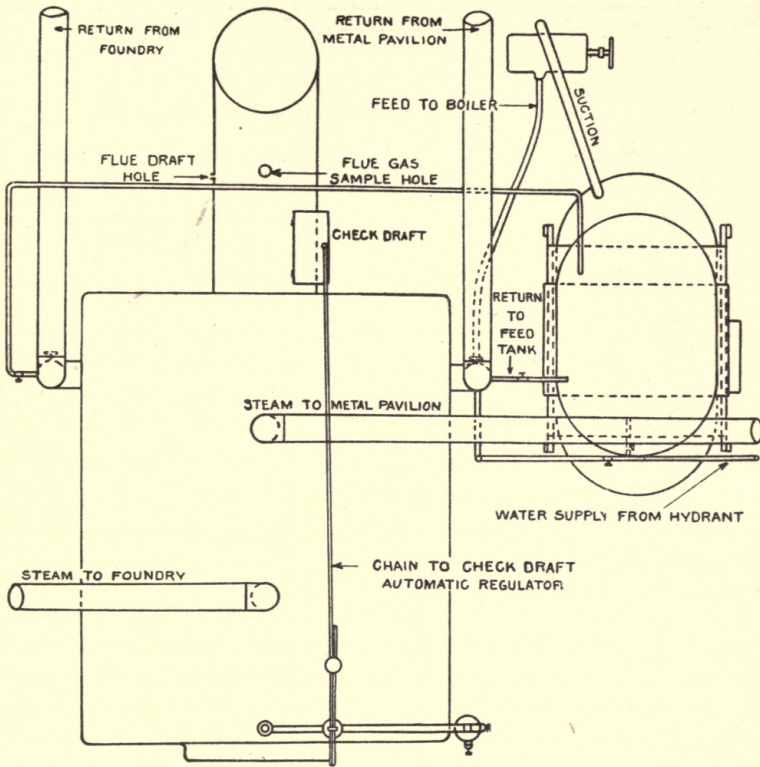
PLAN OF HOUSE-HEATING BOILER PLANT AT ST. LOUIS, MO.
